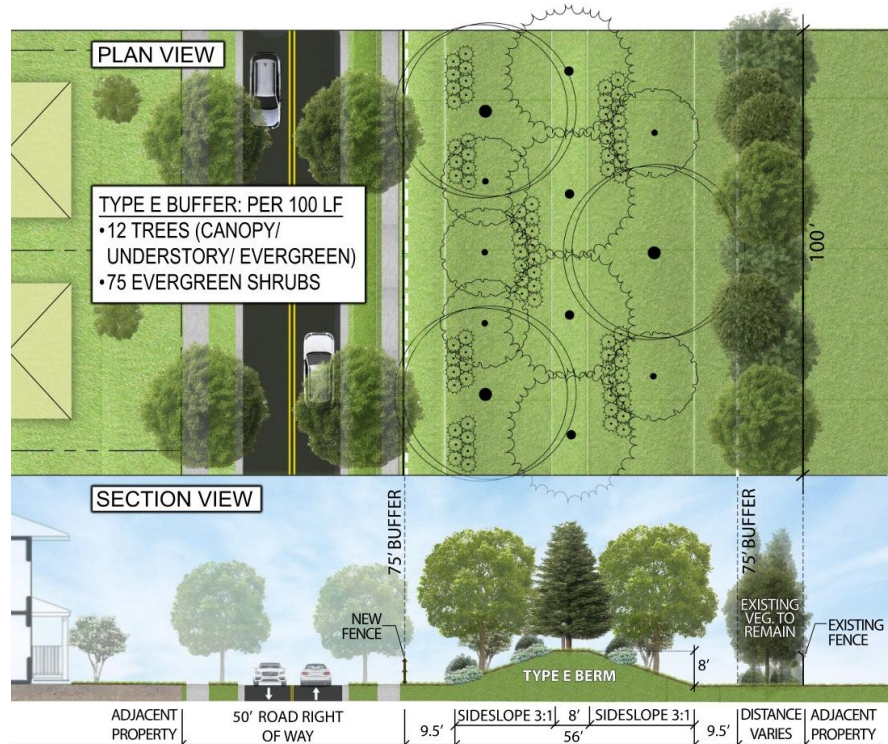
Type E buffer. Berm details: Plan view (top) and section view (bottom)
